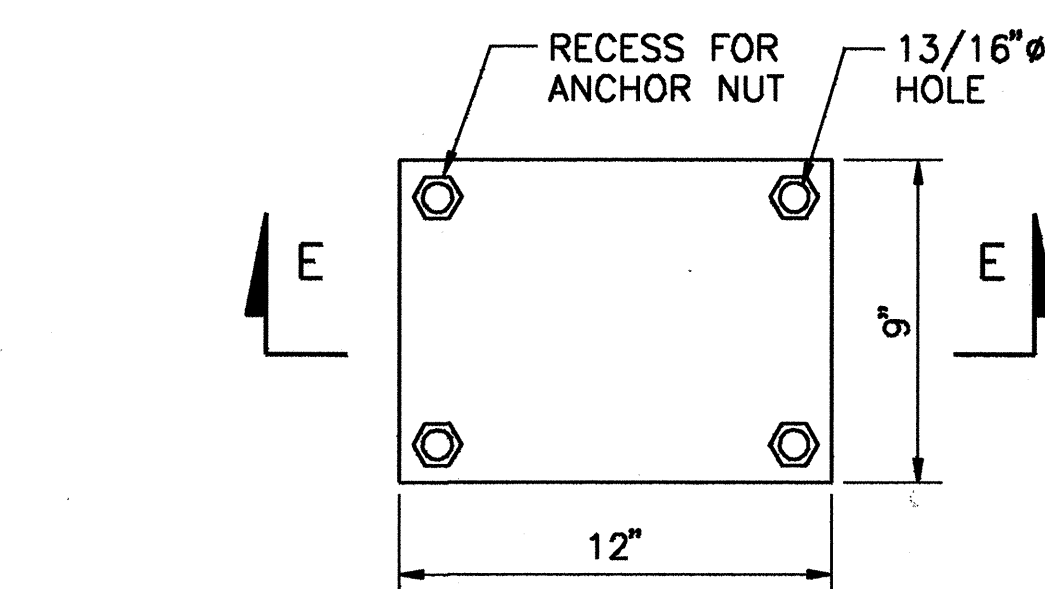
DETAIL D - RECEIVER AND GUIDE SLEEVE BOTTOM
